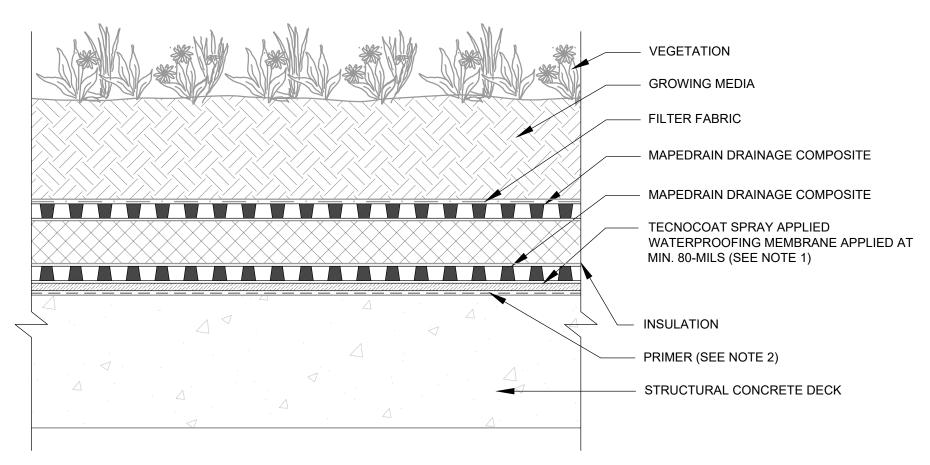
DETAILS ARE INTENDED TO BE A GUIDE FOR WATERPROOFING INSTALLATION ONLY
